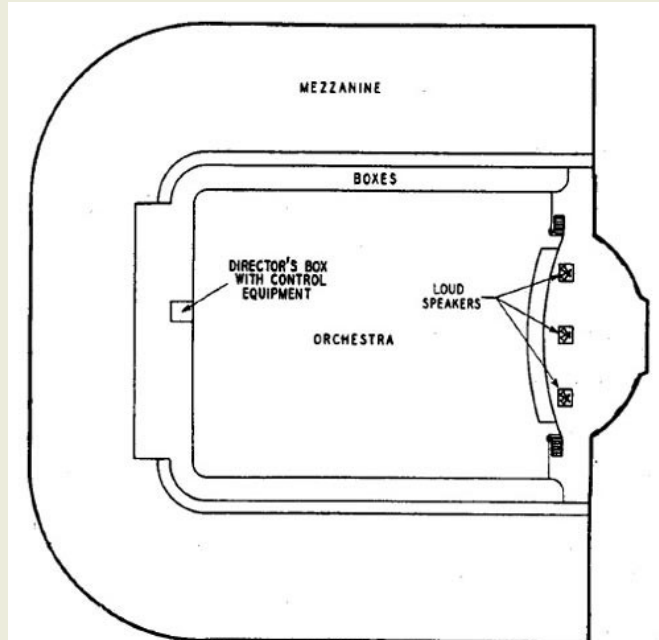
Floor plan of Constitution Hall, Washington, D. C., showing locations of loud speakers
